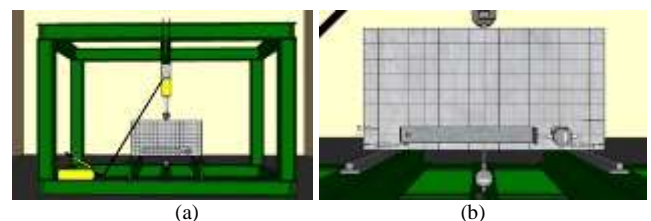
(a) tool setting and testing specimen (b) the close detail
